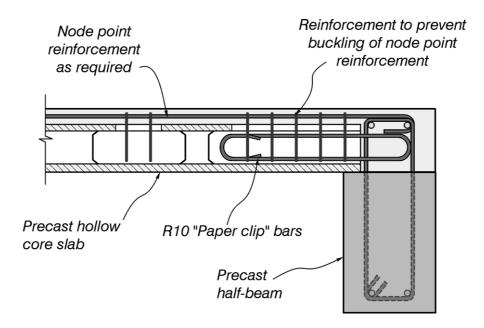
Enhanced tie detail for hollowcore units (after McSaveney, 1997)
